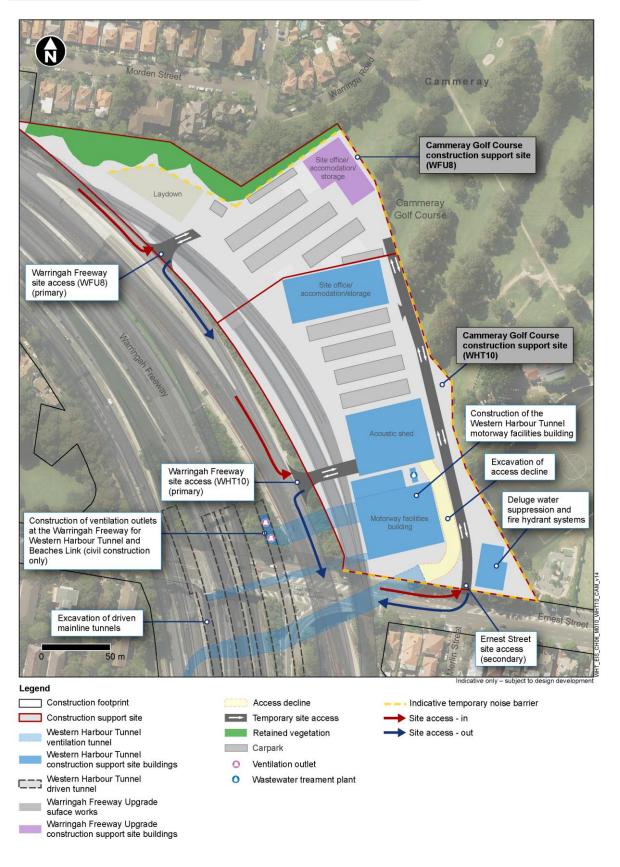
Indicative construction support site layout – WHT10 and WFU8 – Cammeray Golf Course
